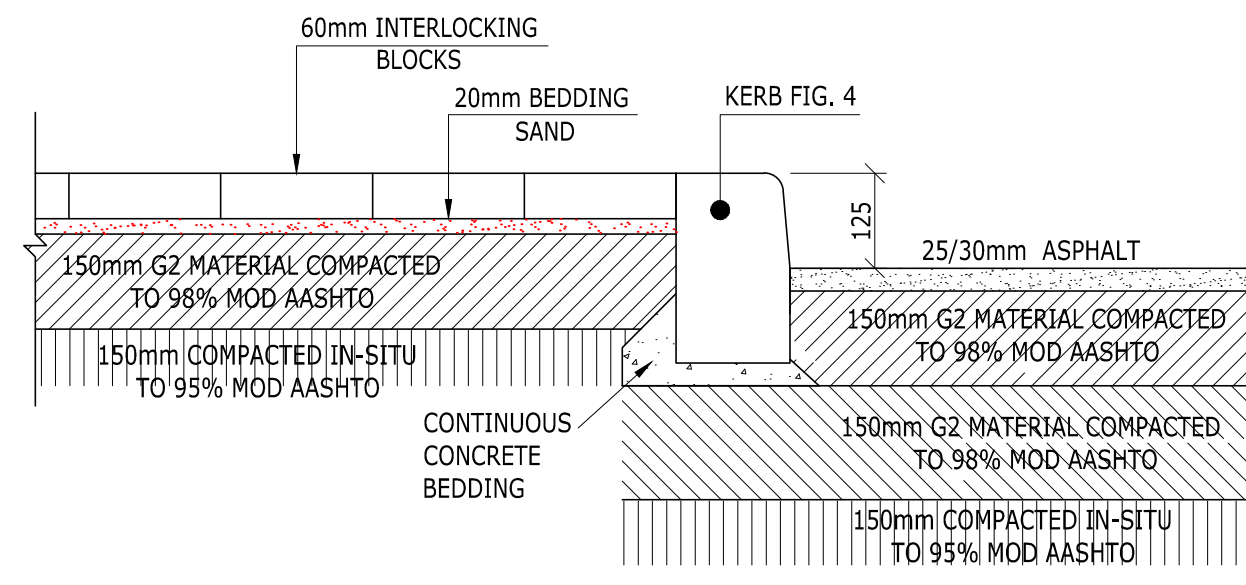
' : TYPICAL PARKING & DRIVEWAY AREA (ASPHALT FINISH)
